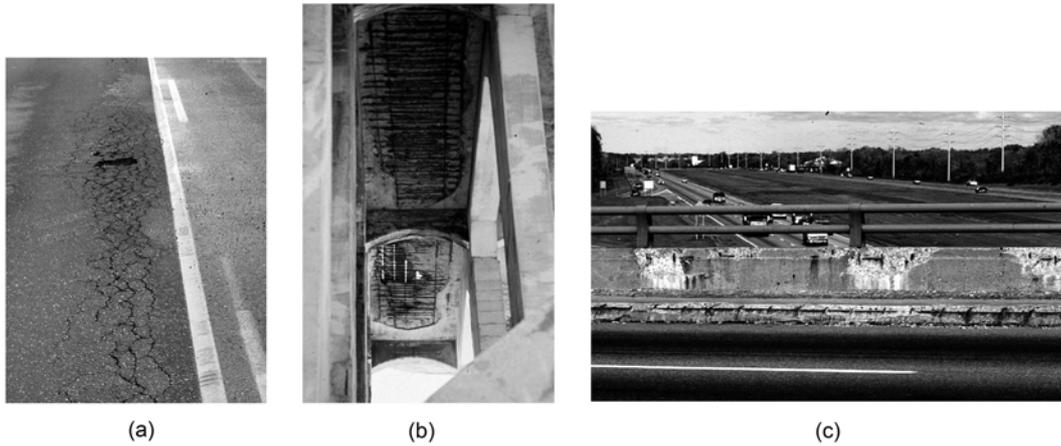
Superficial damage that requires repair before structural damage develops, and that is unlikely to cause a change in the dynamic response of a structure. (a) Cracks and a pot-hole in a bridge running surface; (b) Spalling of concrete from the underside of a bridge beam; and (c) Spalling and staining of a bridge parapet
